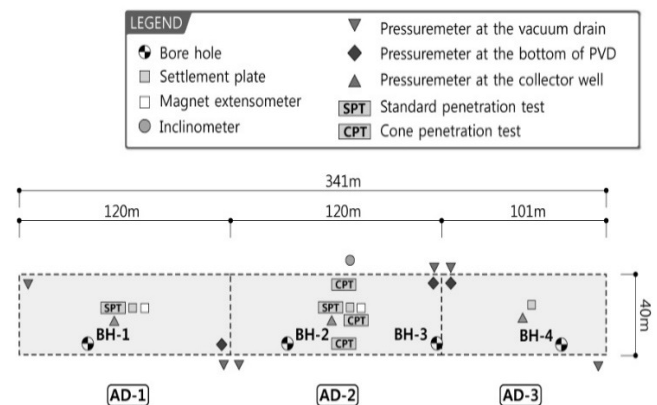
A plan view of project site with locations of exploratory borings and field instrumentations
